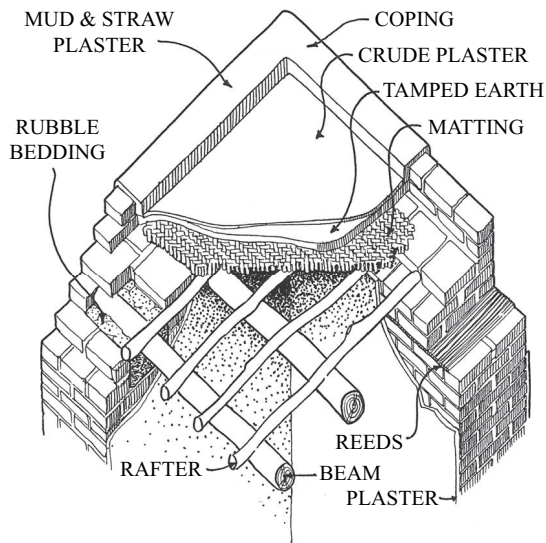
Drawing from Yale Archive showing roof construction method. YUAG Yale-2240.
